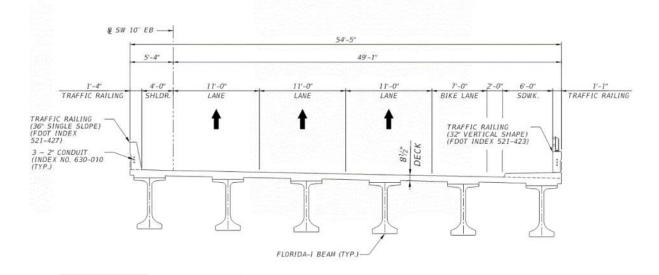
Bridge Typical Section (Bridge No. 8)
